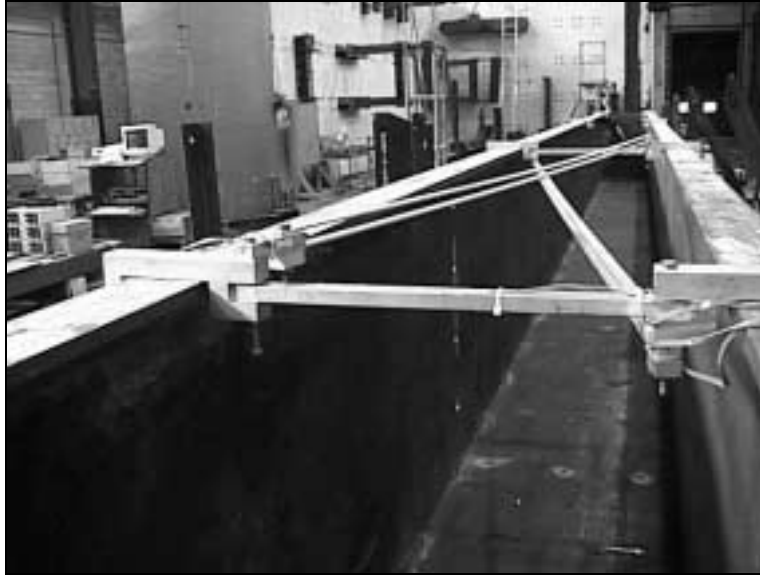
Original Brace, Coupler, and Flange Mount Connection
